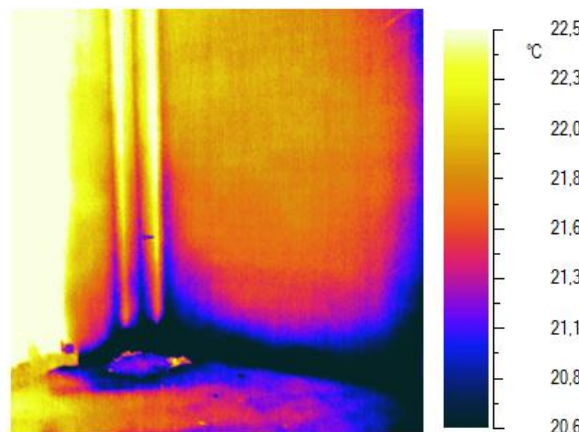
Thermogram of column 2, from the exterior of the northwest wall, June 16th, 2016.
